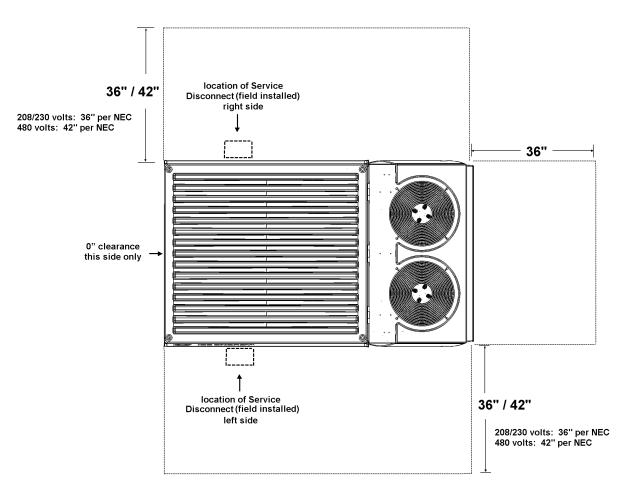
Minimum Clearances for Unit-mounted Service Disconnect
